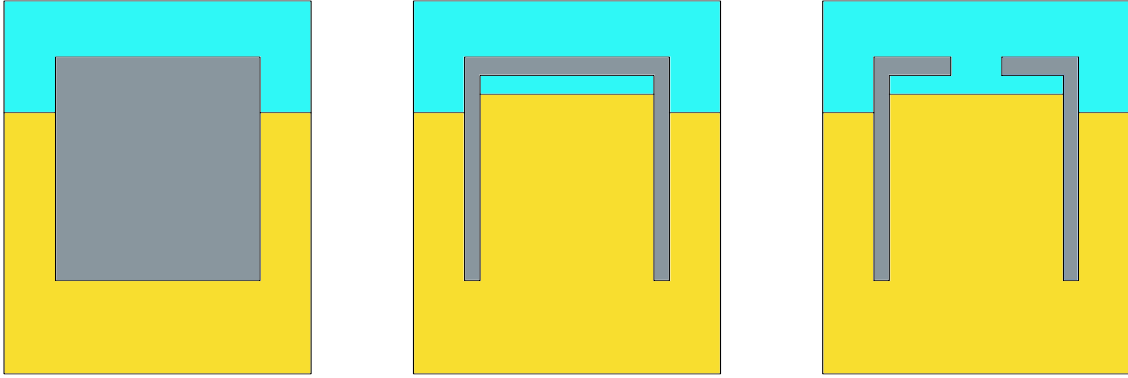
Sketch of the foundation. From left to right: Assumed foundation, suction caisson with closed top plate and suction caisson with open top plate
